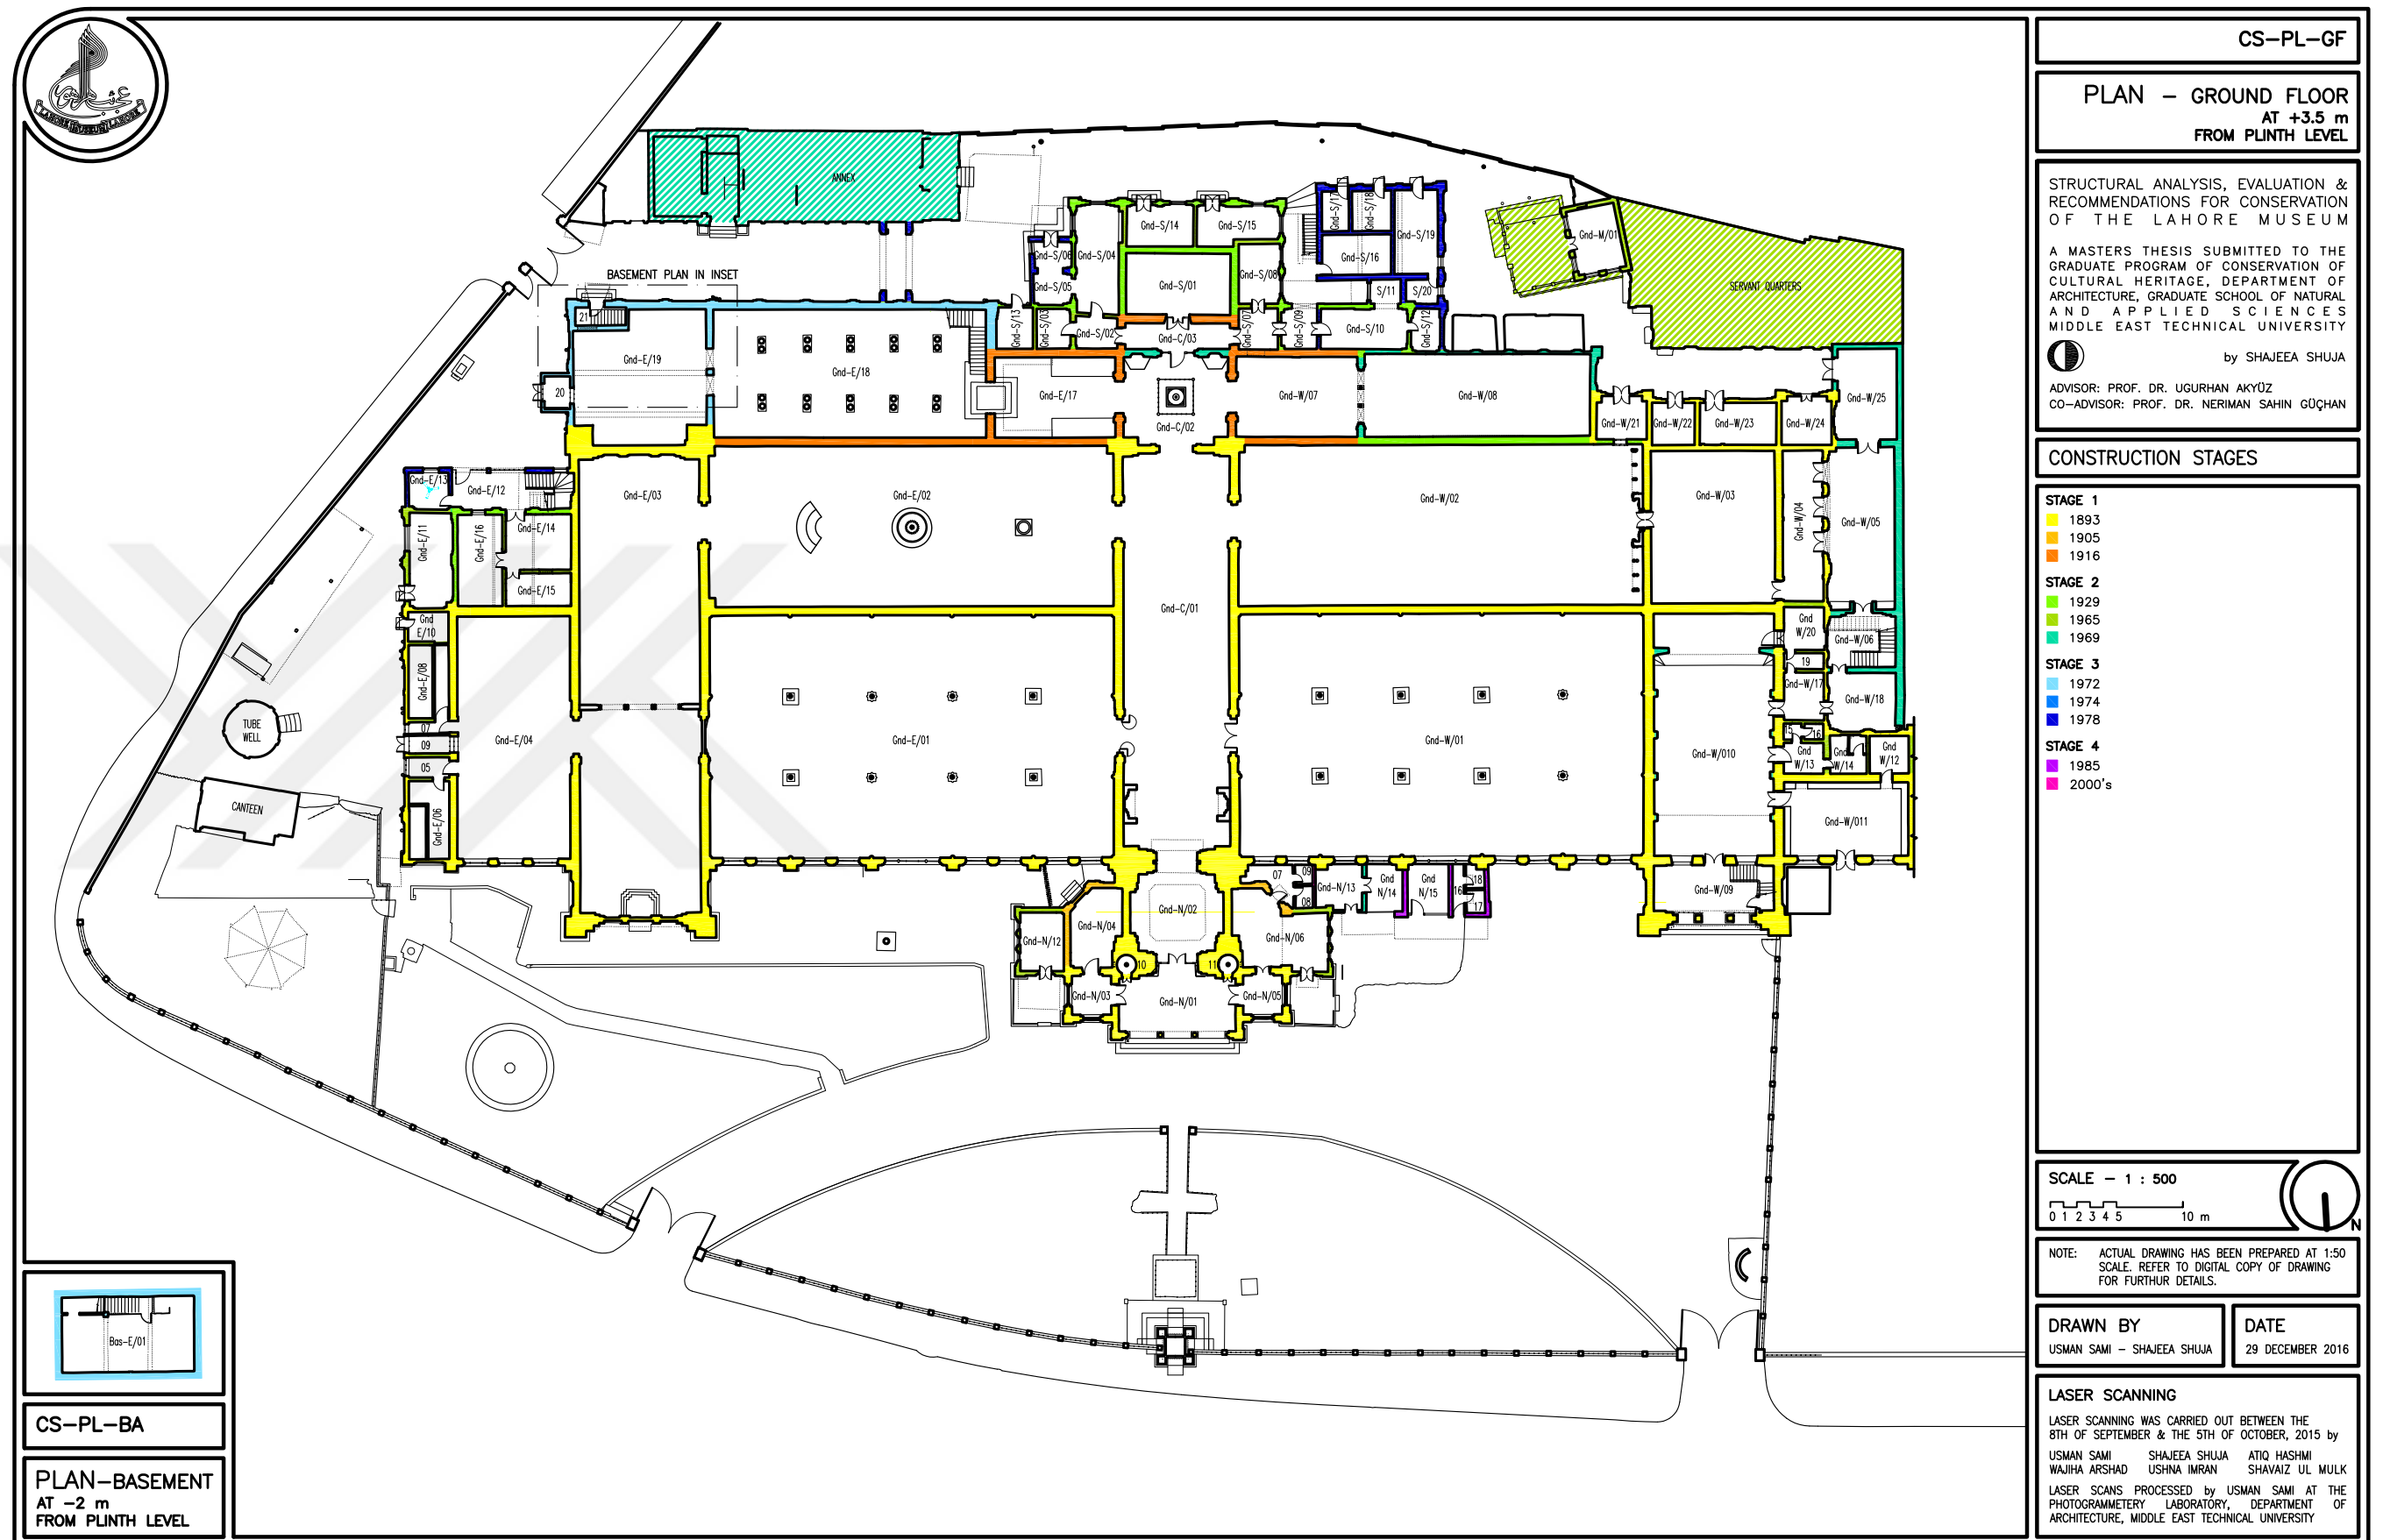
CS-PL-GF / BA – Construction Stages – Plan – Ground Floor / Basement (2017)
